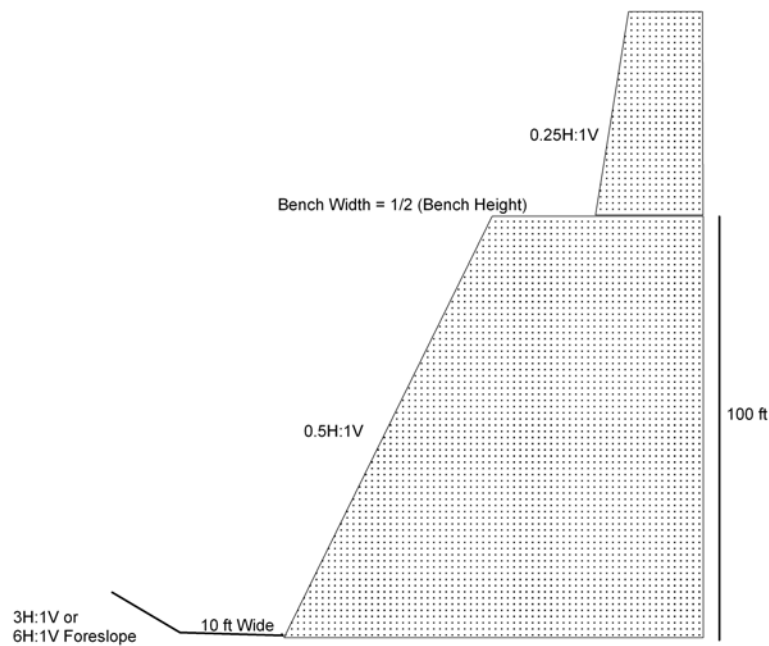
Recommended slope design for competent design units, option 1. The bench height shown in the figure is for situations where a 10 ft (3 m) high catch fence is used as a rockfall barrier.
